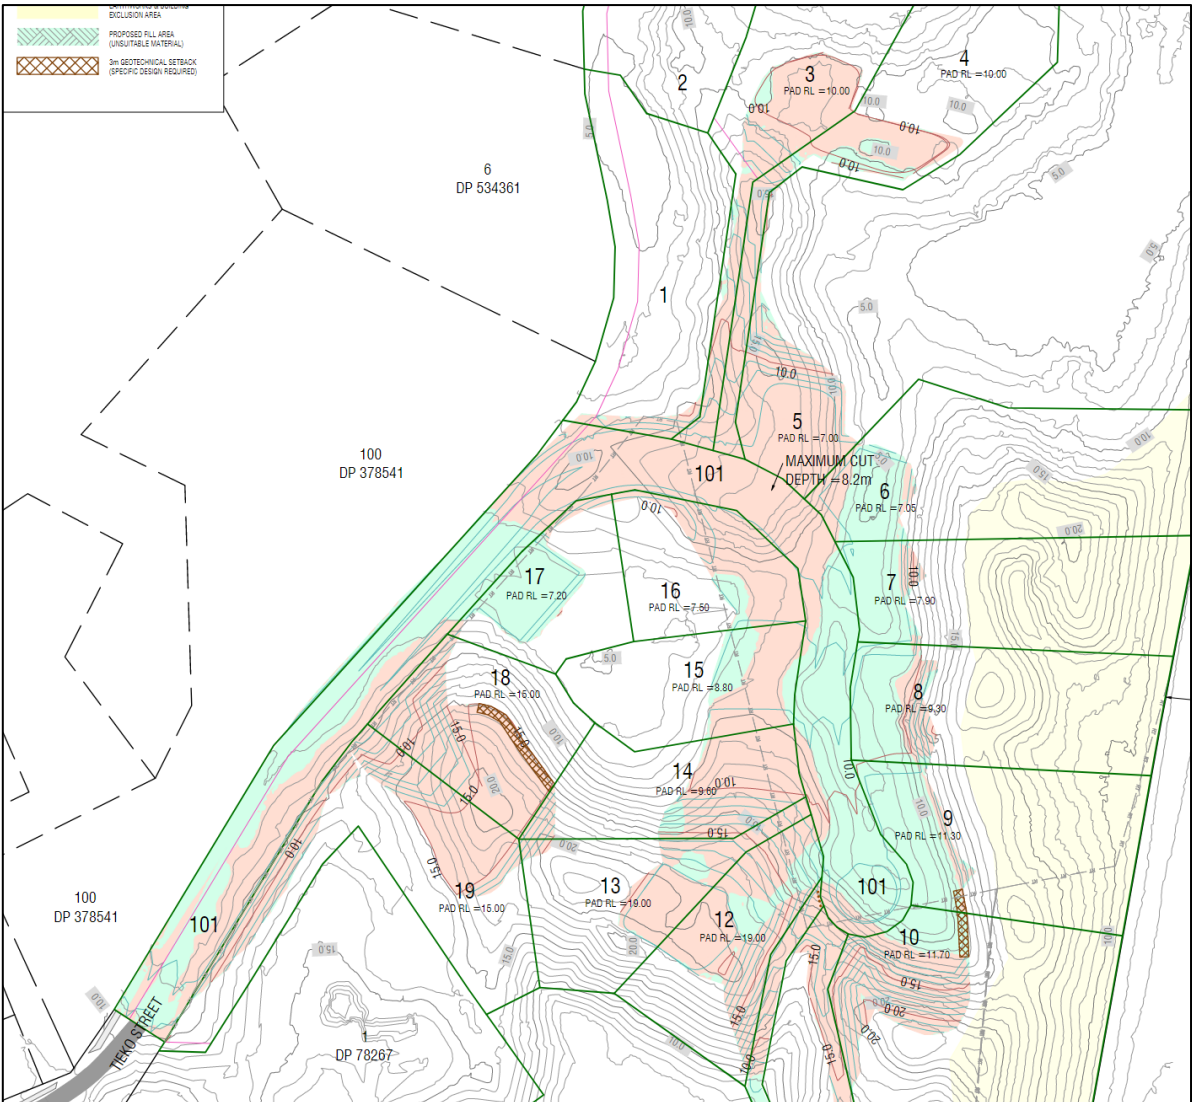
Plan showing the proposed earthworks for the northern portion of the proposed subdivision
